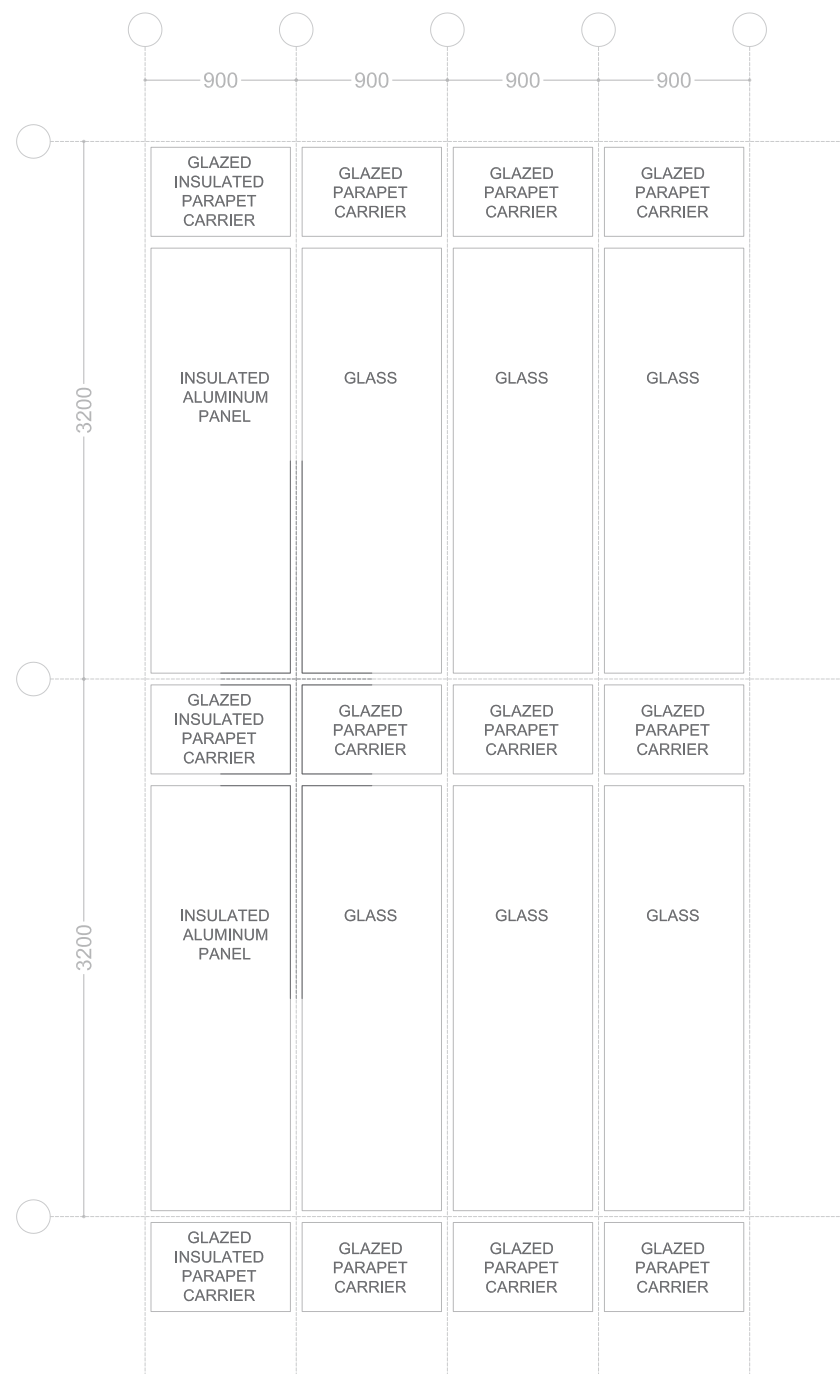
Indicative elevation view of typical curtain wall facade (Source – Author)
